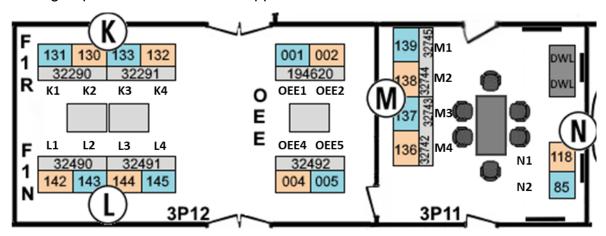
LCC ROOMS 3P11/3P12 SEATING PLAN - FLOOR PLAN
